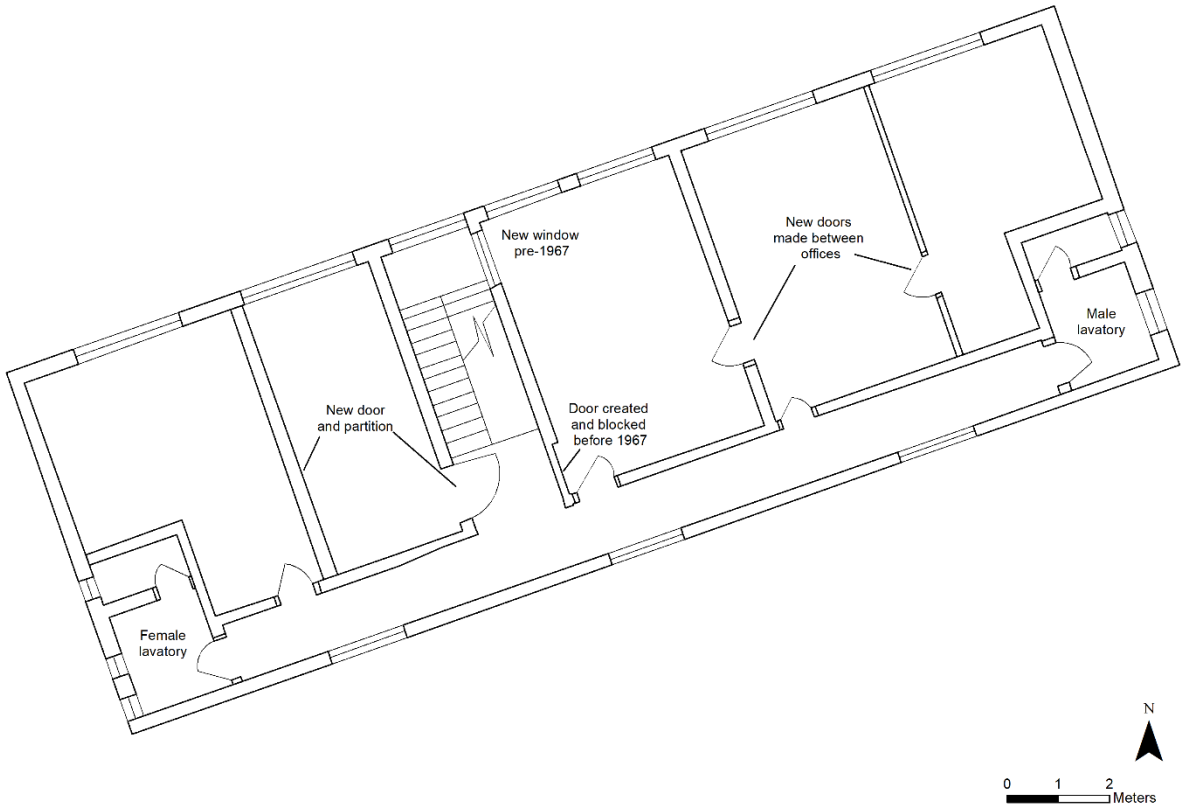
The K51 first-floor offices in 1967 based on building control plan TWAM CB.GA/BC/plan/1967/540.
